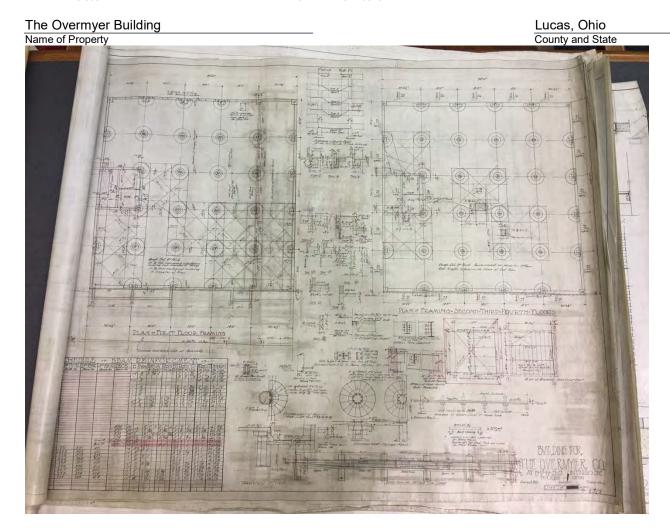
H. Original Four-Story Building First-Fourth Floor Framing Plan
